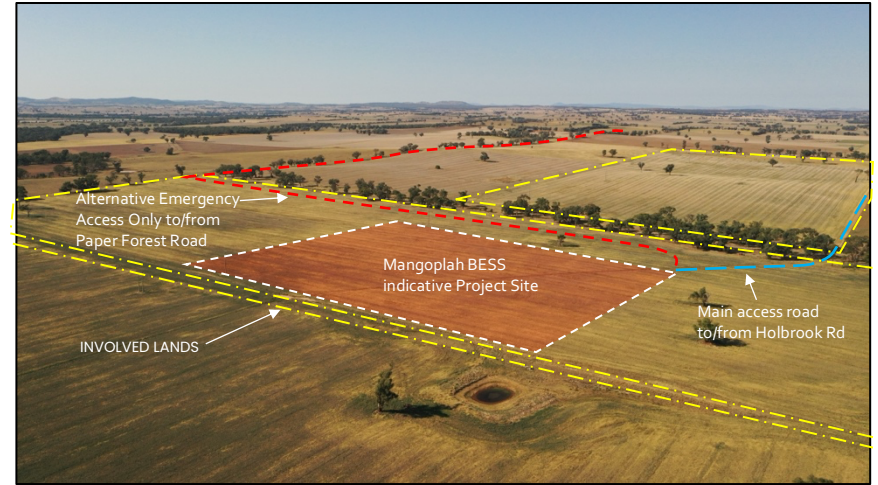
Looking southeast at the indicative Mangoplah BESS Project Site showing the extent of surrounding hazard vegetation and alternative access/egress road. (Hague, 2025)
